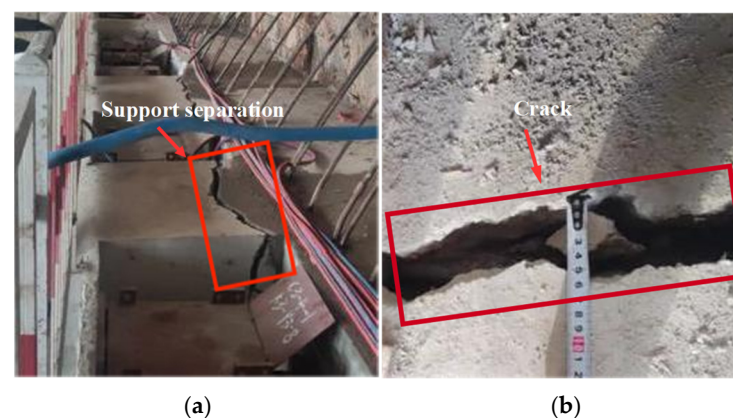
Schematic diagram of cracks in double-purlin servo supports: (a) Support separation gap; (b) Crack measurement.
